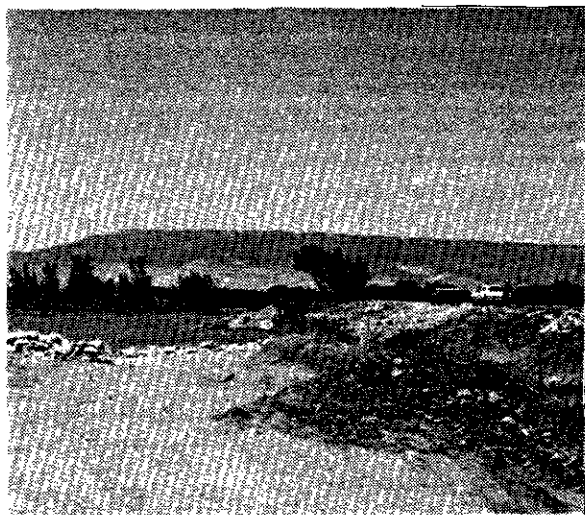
Olathe Sewage Lagoon Bank Protection Provided by Colorado Highway Department During Flood Fight.
